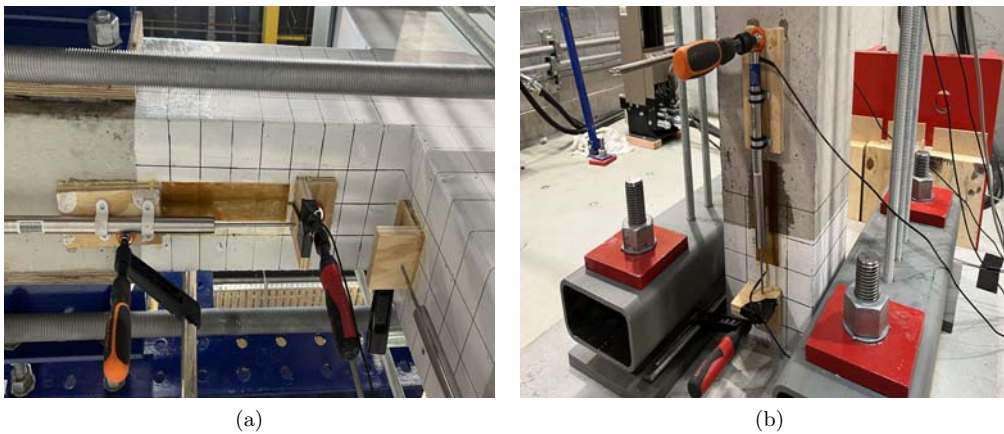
Flexible strain sensors installation (a) 1 full-bridge installed on beam with LVDT 11 (b) 2 half-bridges connected as 1 full-bridge installed on column with LVDT 1 and 2.
